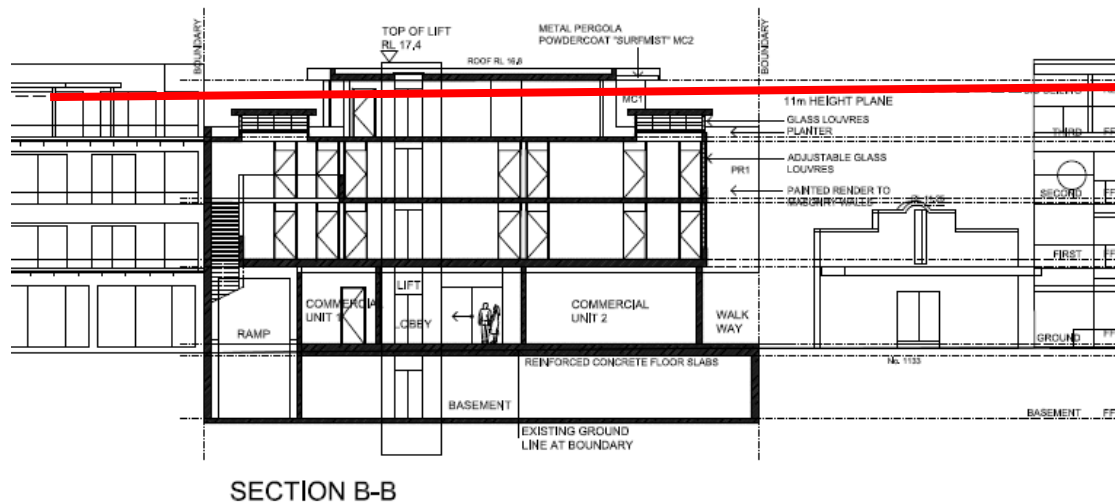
Plan (section B-B) extract showing extent of 11 metre building height breach
